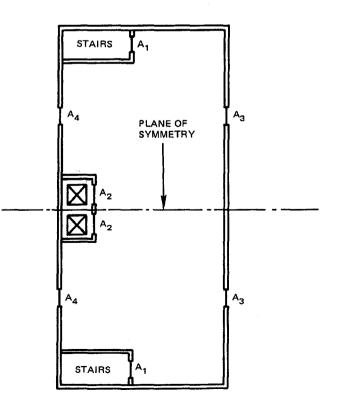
Building floor plan illustrating symmetry concept.
